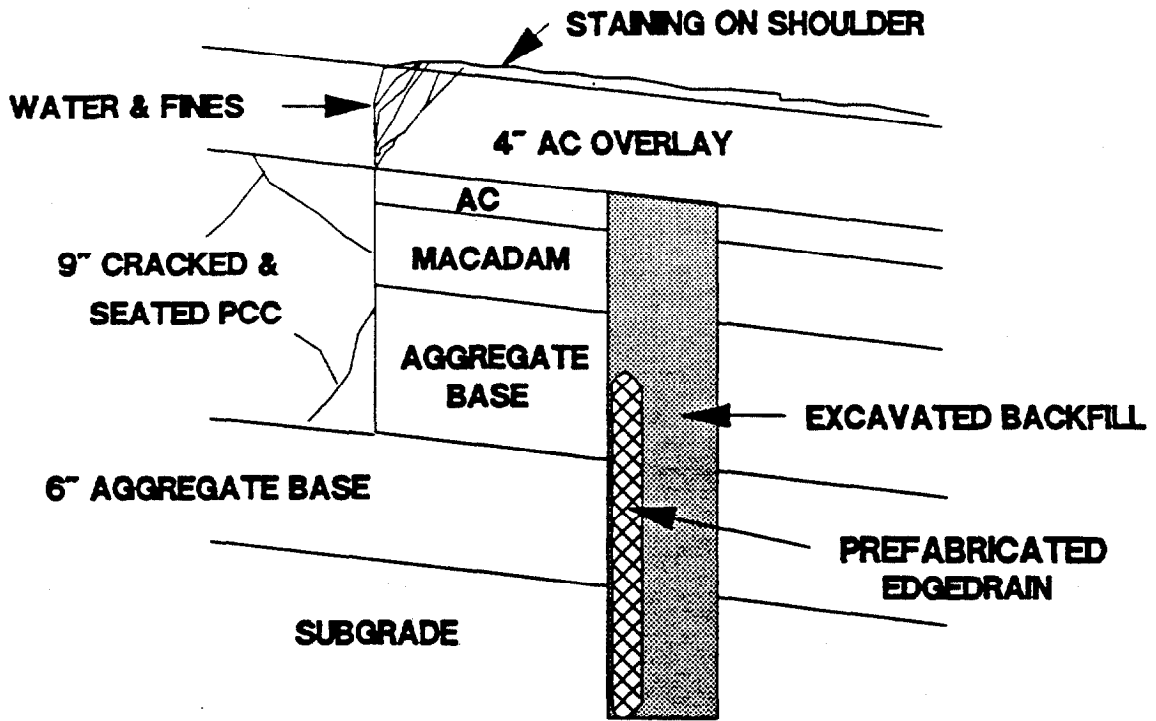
ACTUAL PREFABRICATED EDGEDRAIN PLACEMENT
